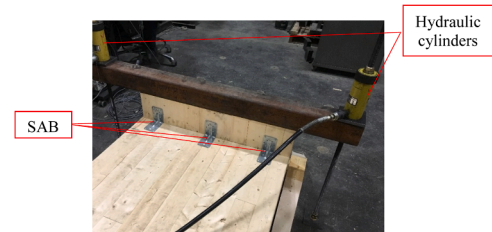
Installation of three steel angle brackets (only installed on upper wall segment).
